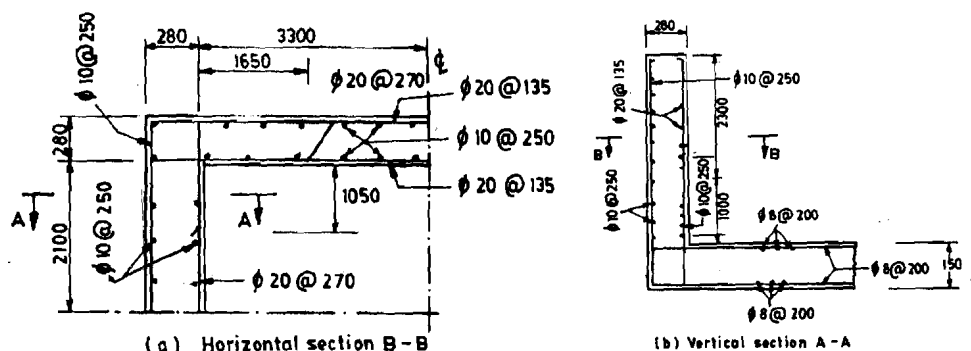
Reinforcement Detail in Rectangular Tank
